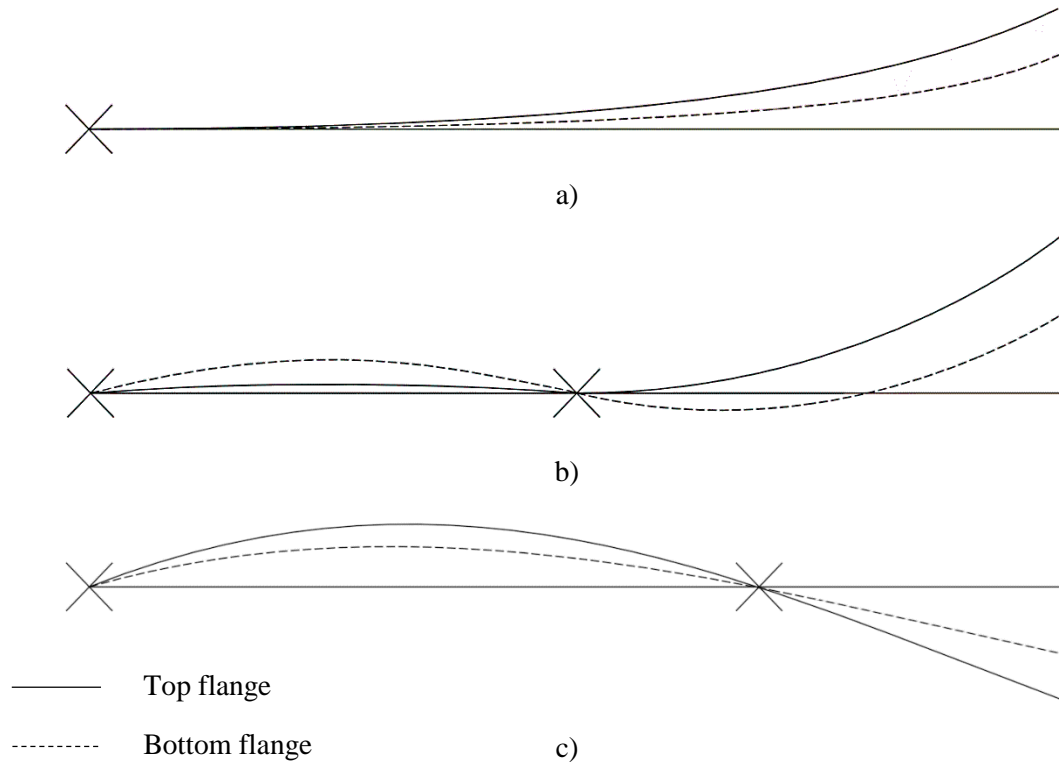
Top view of lateral deflection of a) cantilever 1T1, b) overhang beams 3S1 and c) 5T1.
